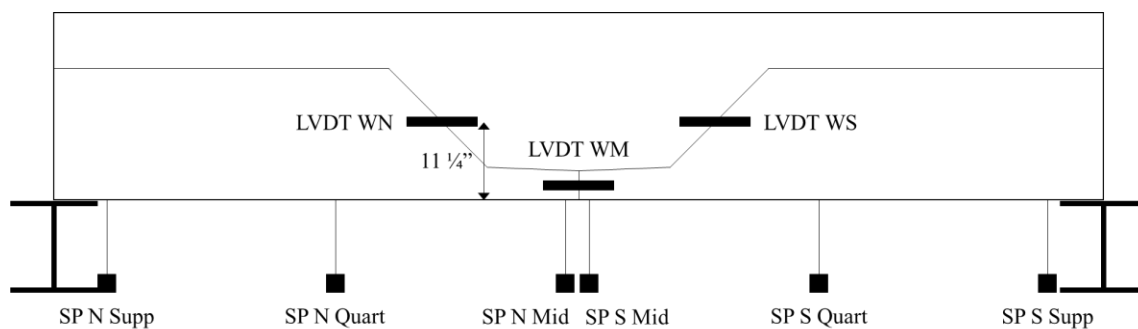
Elevation View of Wire Pots and LVDT on Sub-assembly Specimen
